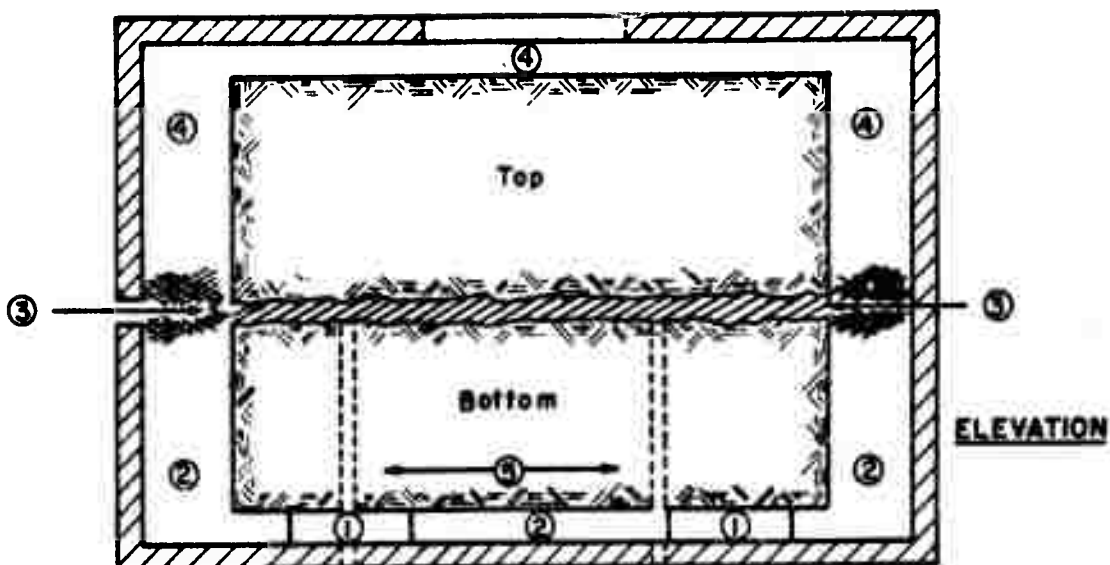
SHEAR SPECIMEN ASSEMBLED FOR TESTING (LEGEND IN TEXT)
